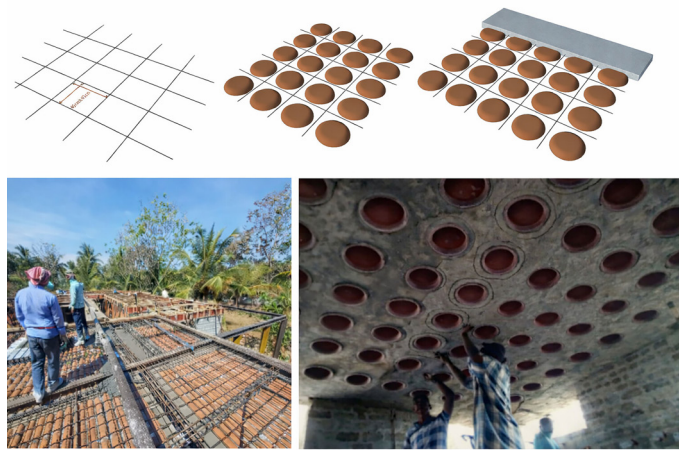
RCC Filler Slab construction (above – the process of laying & below - site construction).
